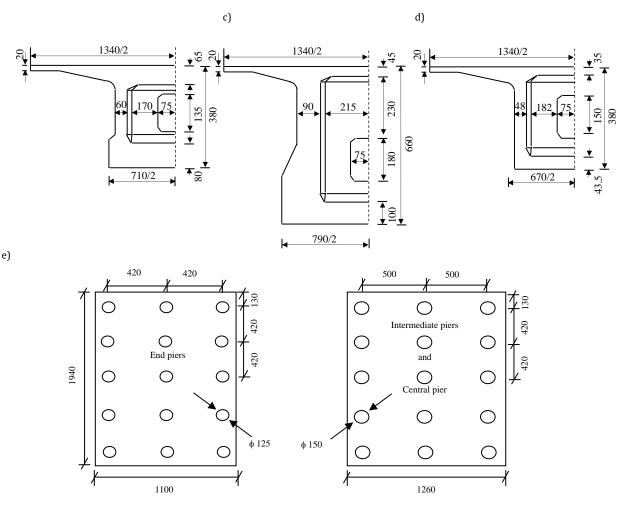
(b) cross-section of A-A (c) cross-section of B-B, (d) cross-section of C-C, and (e) arrangement of piles below end piers and intermediate and central piers (all units are in cm) (Gharad and Sonparote 2020).
